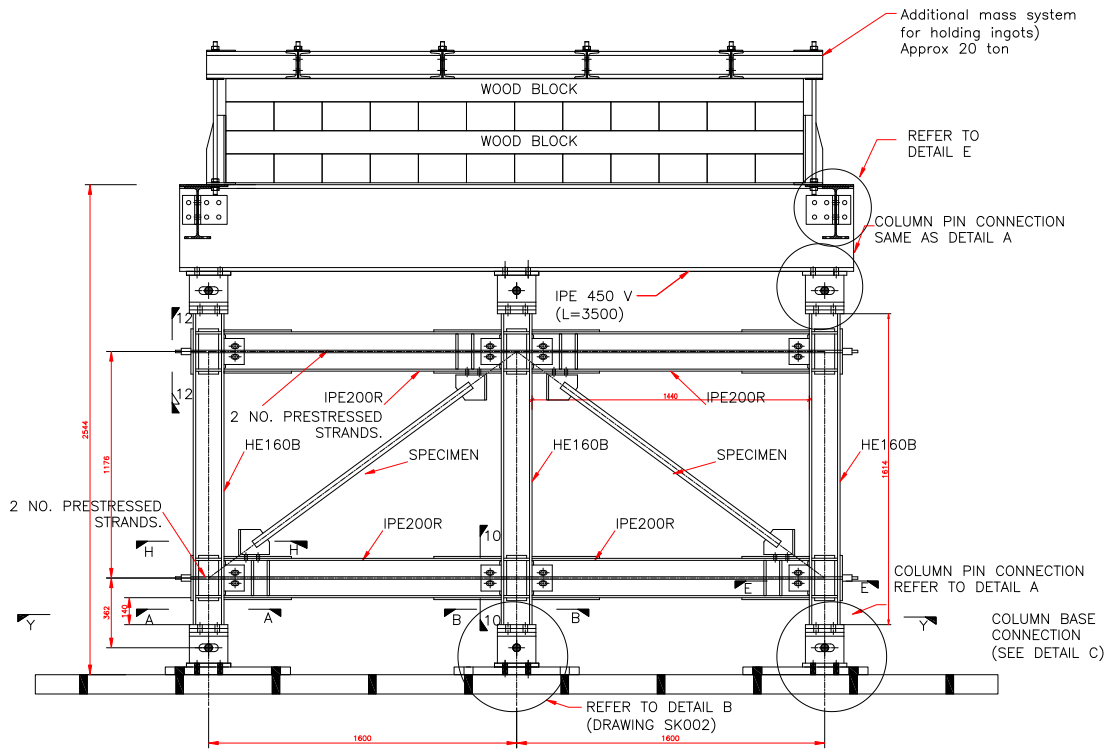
Technical drawing of the tested system (middle frame elevation view)
